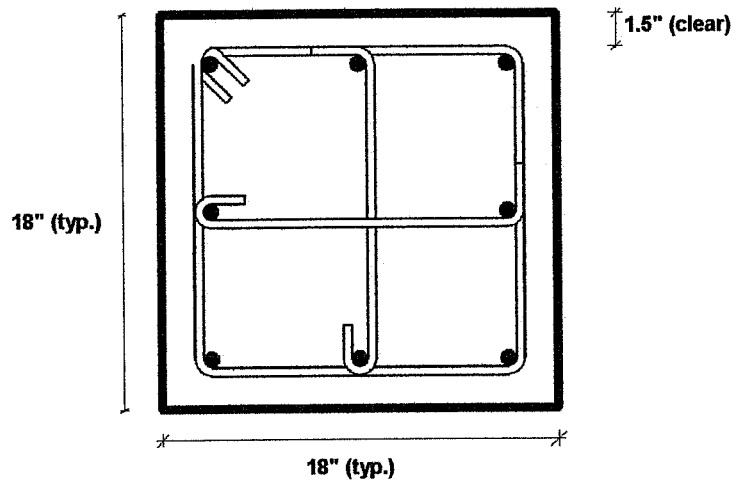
Beam cross section details and reinforcing schedule for the three-story building.
